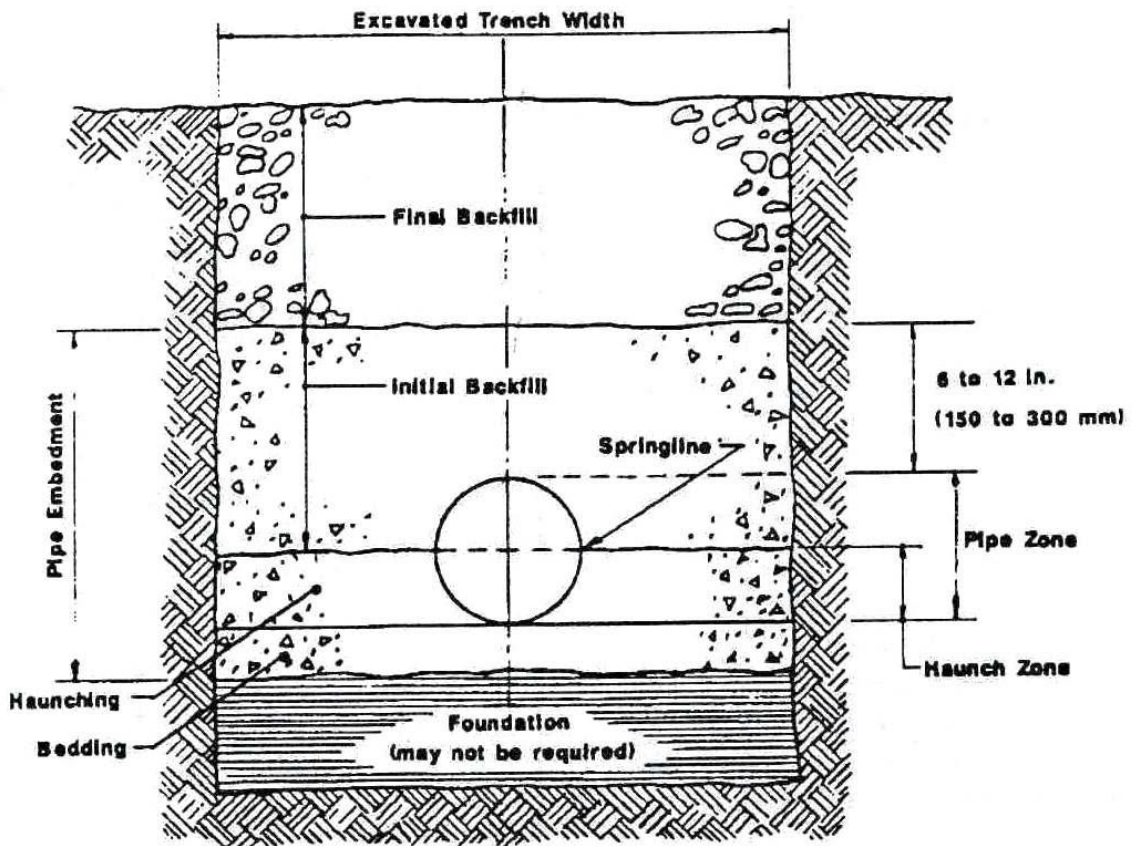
Trench Cross Section Showing Terminology (ASTM D 2321)
